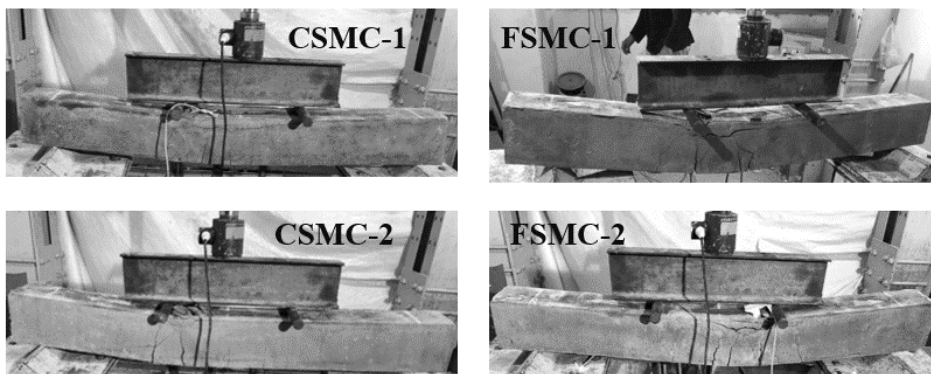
Failure Mode of Control and Fire Damaged Beams Strengthened with Micro-Concrete
